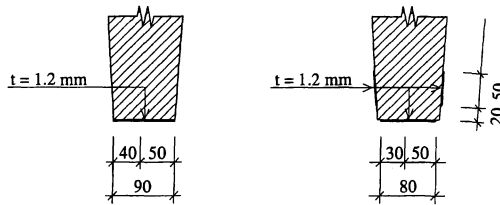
Arrangement of the CFRP plates (beam no.3 and no.4)
